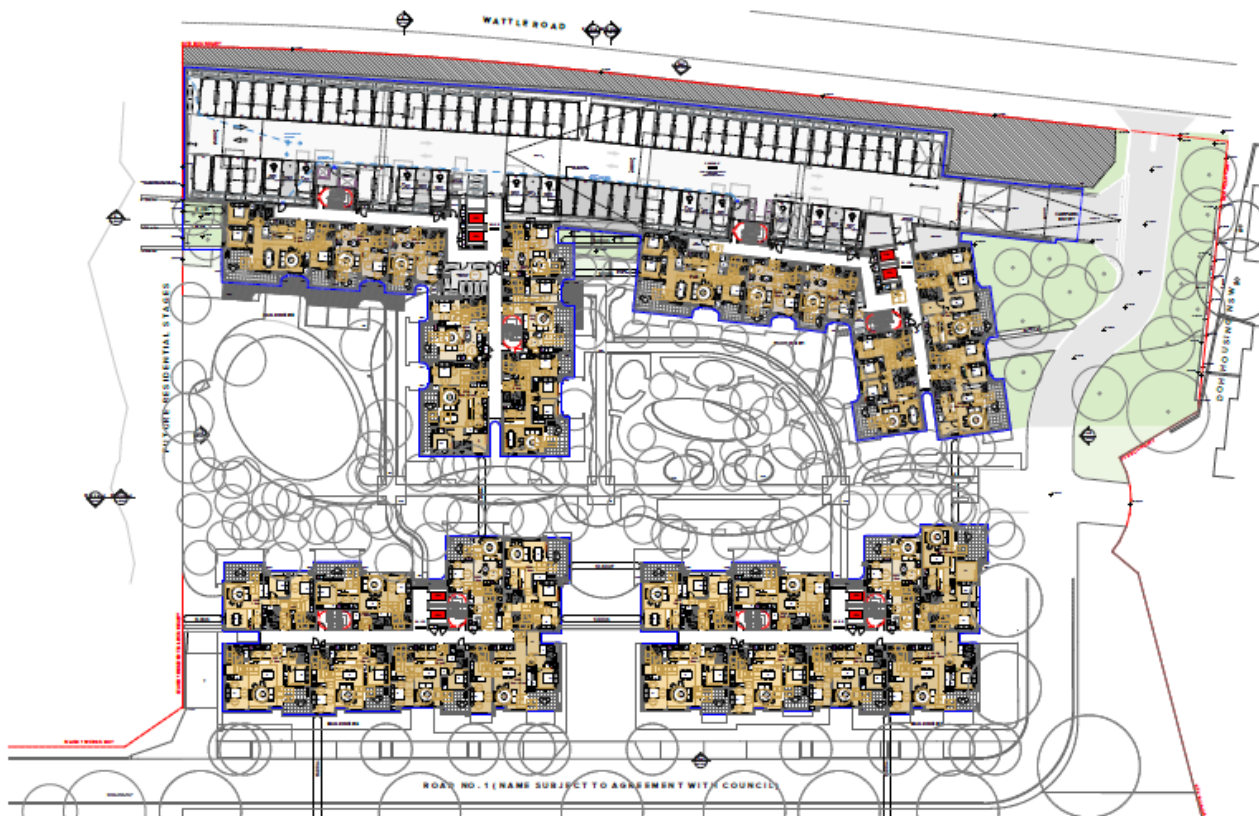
Upper Level of basement parking, with access off the southern section of the proposed new road
